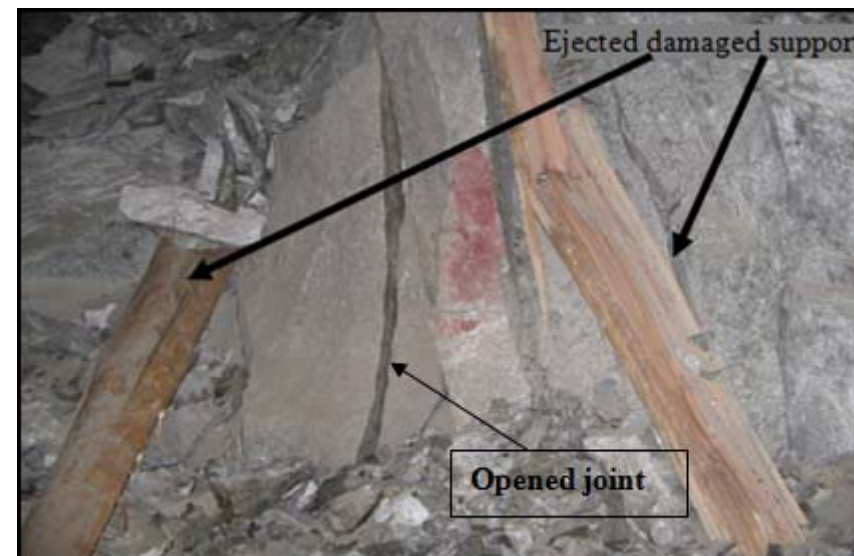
Footwall damage observed on the pillar at the entry panel 6S.
